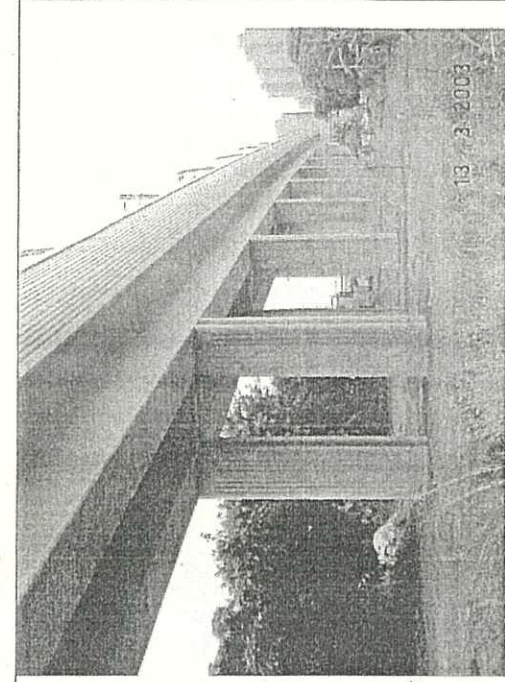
Landscape Planting near Tsing Chuen Wai (Piers 40-46)
